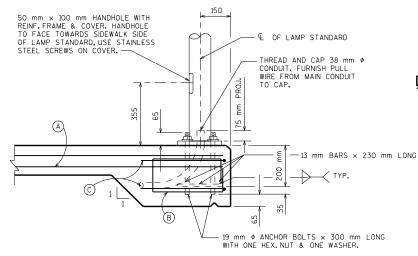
DETAIL 'A' SEE STANDARD 30.11 FOR POST ATTACHMENT DETAILS △ DRILL 5 mm ∮ DRAIN HOLE PARALLEL TO ROADWAY IMMEDIATELY ABOVE GROUT IN POST
